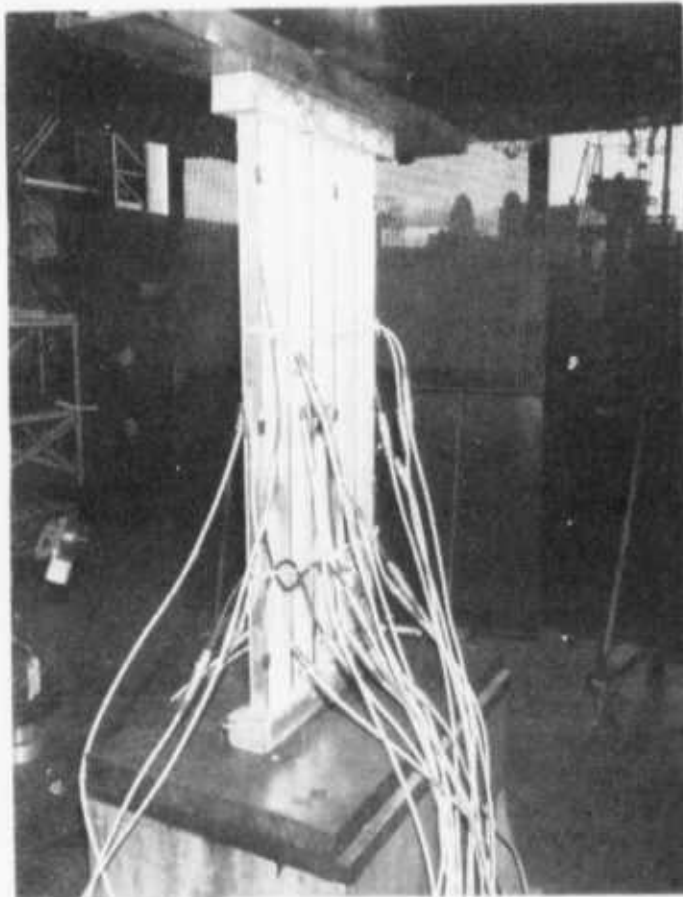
TYPICAL INSTRUMENTED COMPRESSION STABILITY
